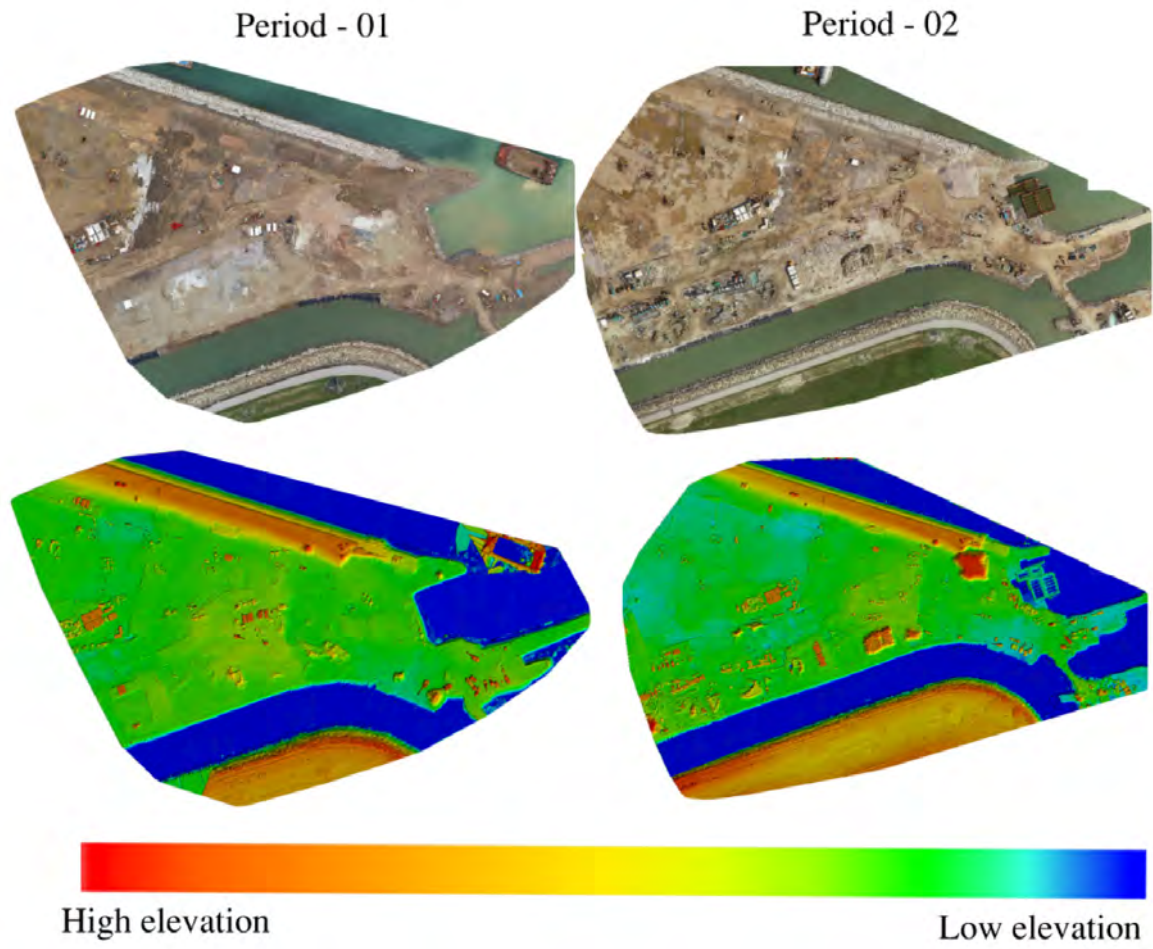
Plan View of Monitored Elevations by Photogrammetry: Orthophotos (Above) and Digital Elevation (Below)
